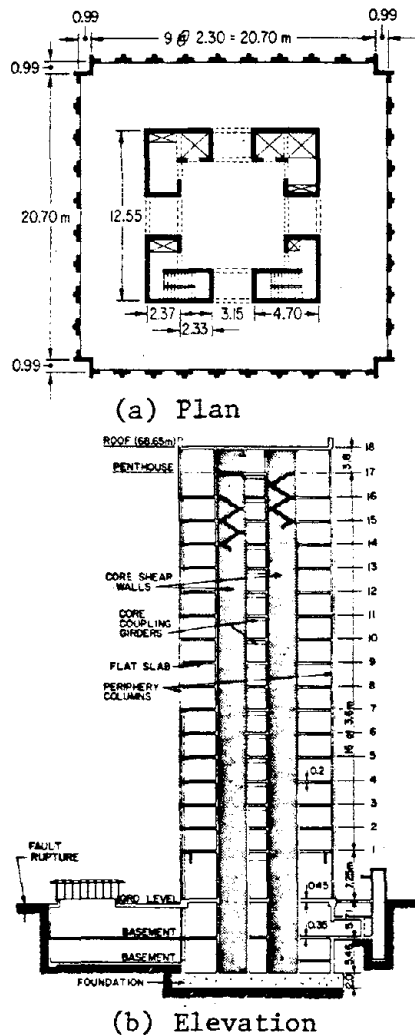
PLAN AND ELEVATION OF BANCO DE AMERICA
